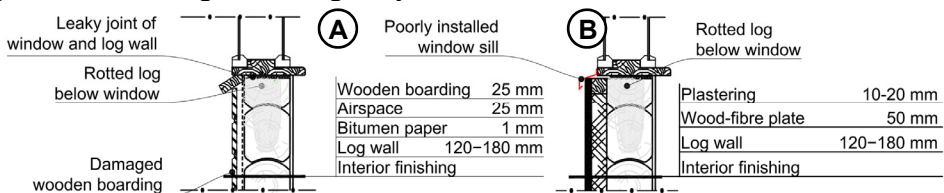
Typical external wall with wooden boarding (A) and plastering (B).
